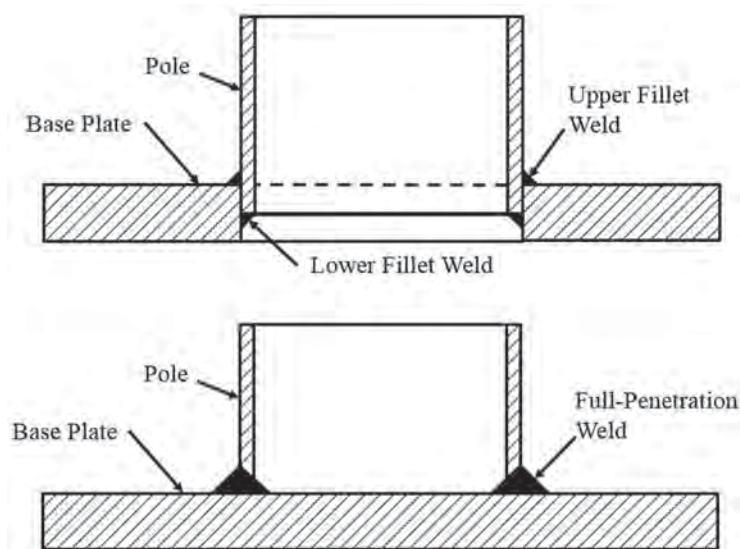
Typical HMLT base connection details: welded-through socket (top) and full-penetration weld (bottom).
